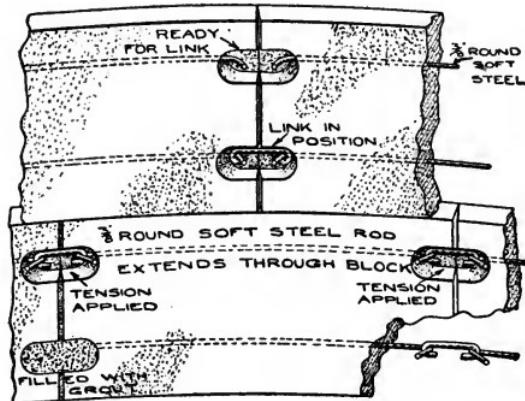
Showing one method of sectional block reinforcement.—Courtesy Hurst Silo Co., Chicago.
